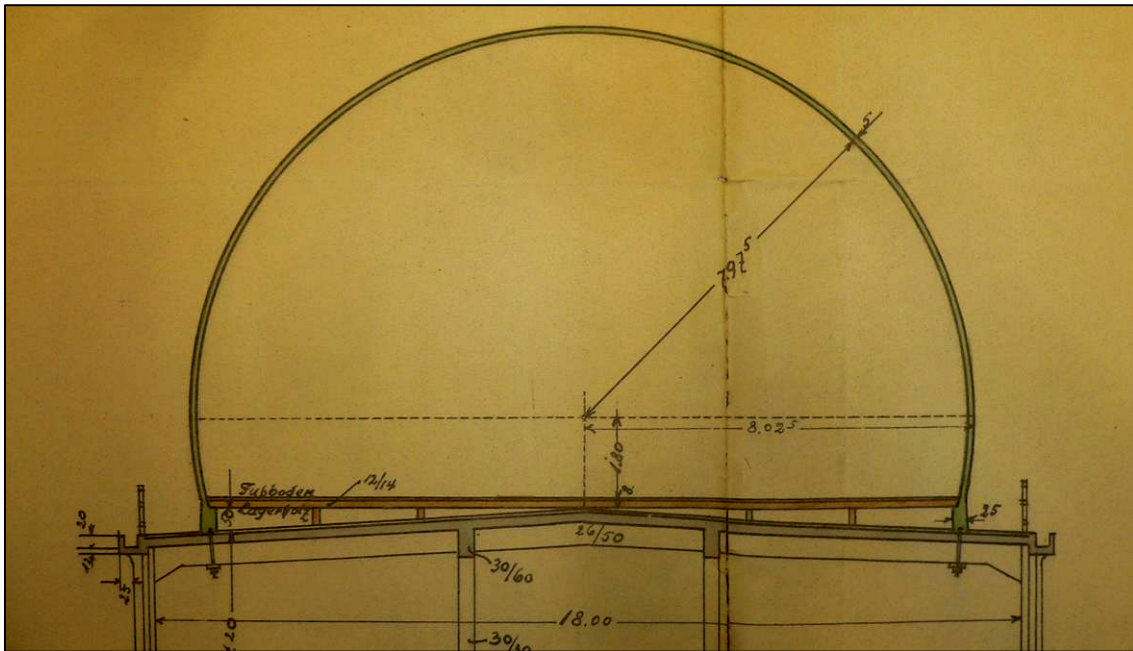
Section of the Zeiss dome and details of the support plates. We can see how the new structure was adapted to the existing factory building.
